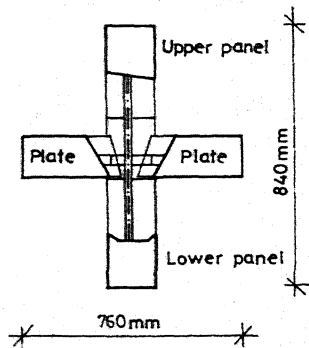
DETAIL OF HORIZONTAL CONNECTION TYPE B<sub>I</sub>
